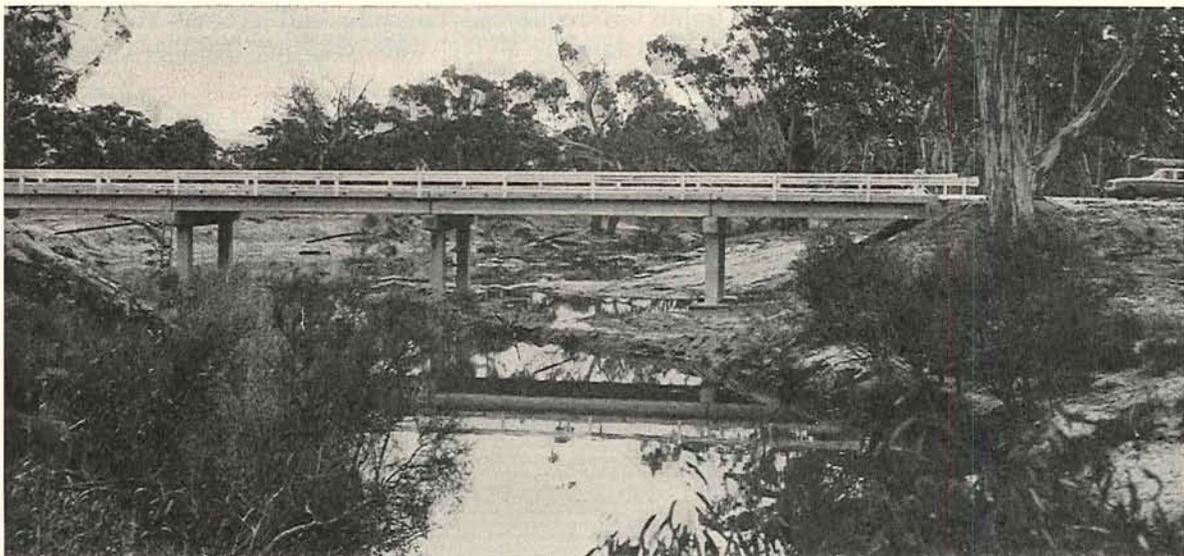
Arapiles Shire—Five-span concrete bridge over the Wimmera River on Polkemet Road.
